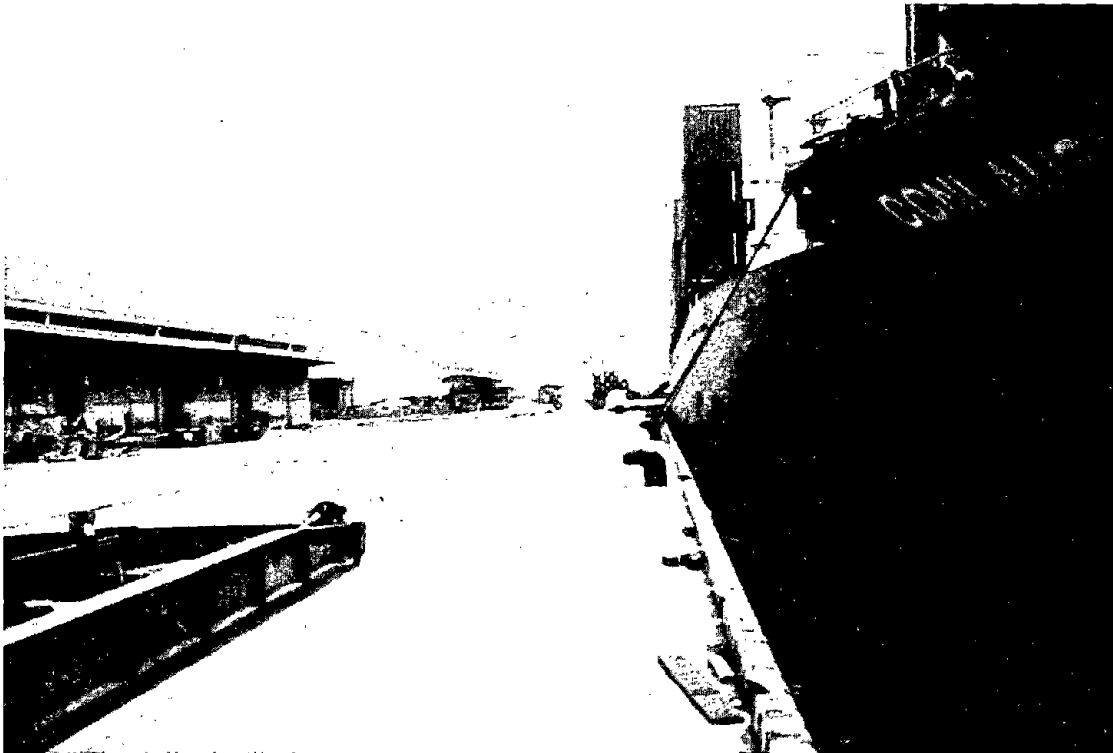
Undamaged Section C pier at Maya-Futo.
